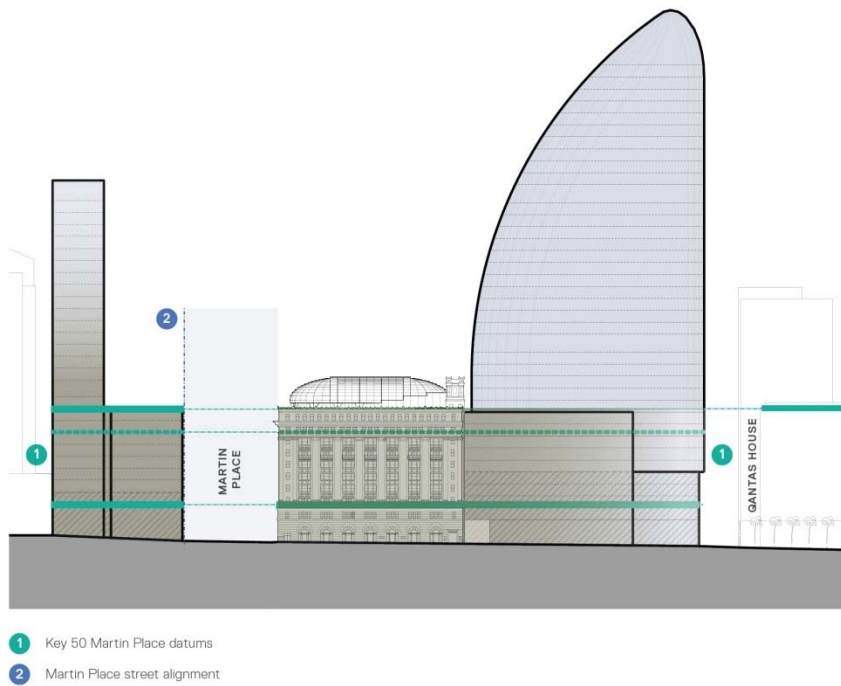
East elevation extract demonstrating future podium materiality key datum lines
